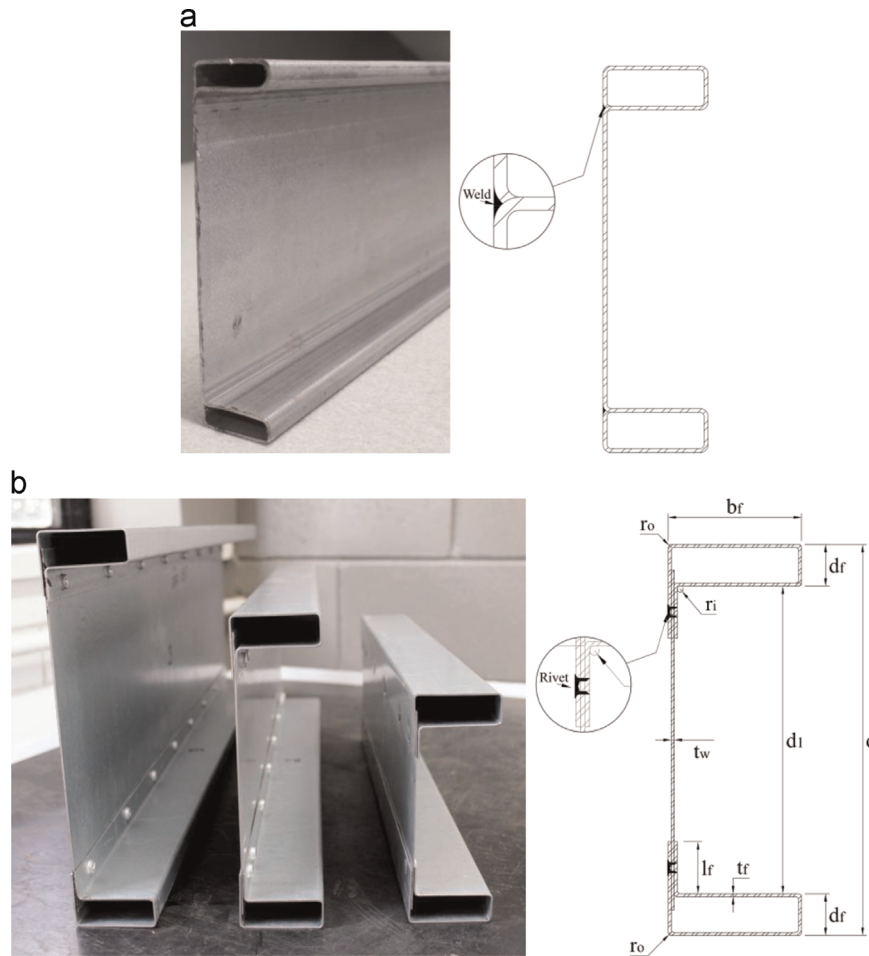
Hollow Flange Channel Beams. (a) LiteSteel Beam (LSB) and (b) Rivet Fastened RHFCB.
